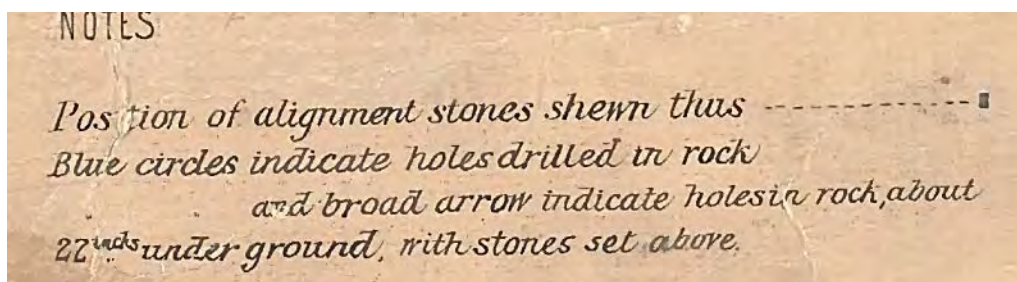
Survey notes from Alignment Plan R23.2113 of 1885.
